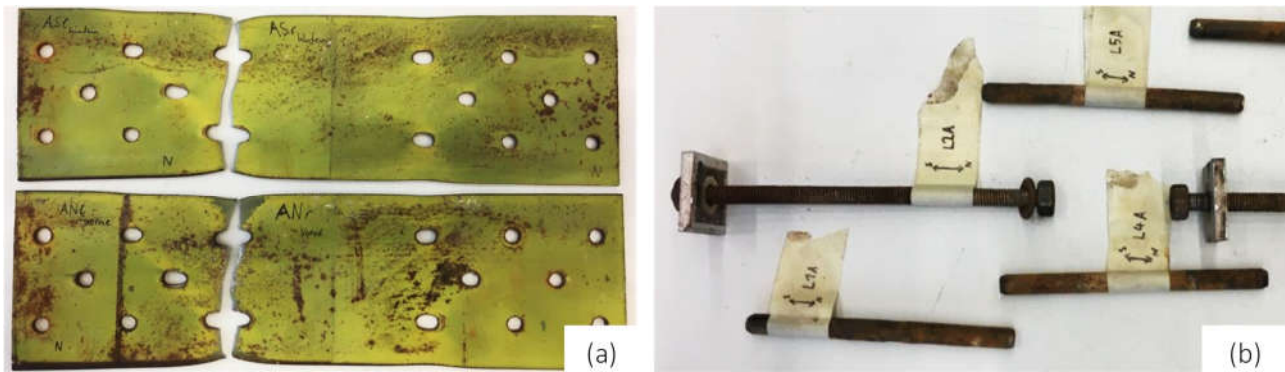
Slotted-in steel plates after testing the first truss (a) and steel dowels (b).
